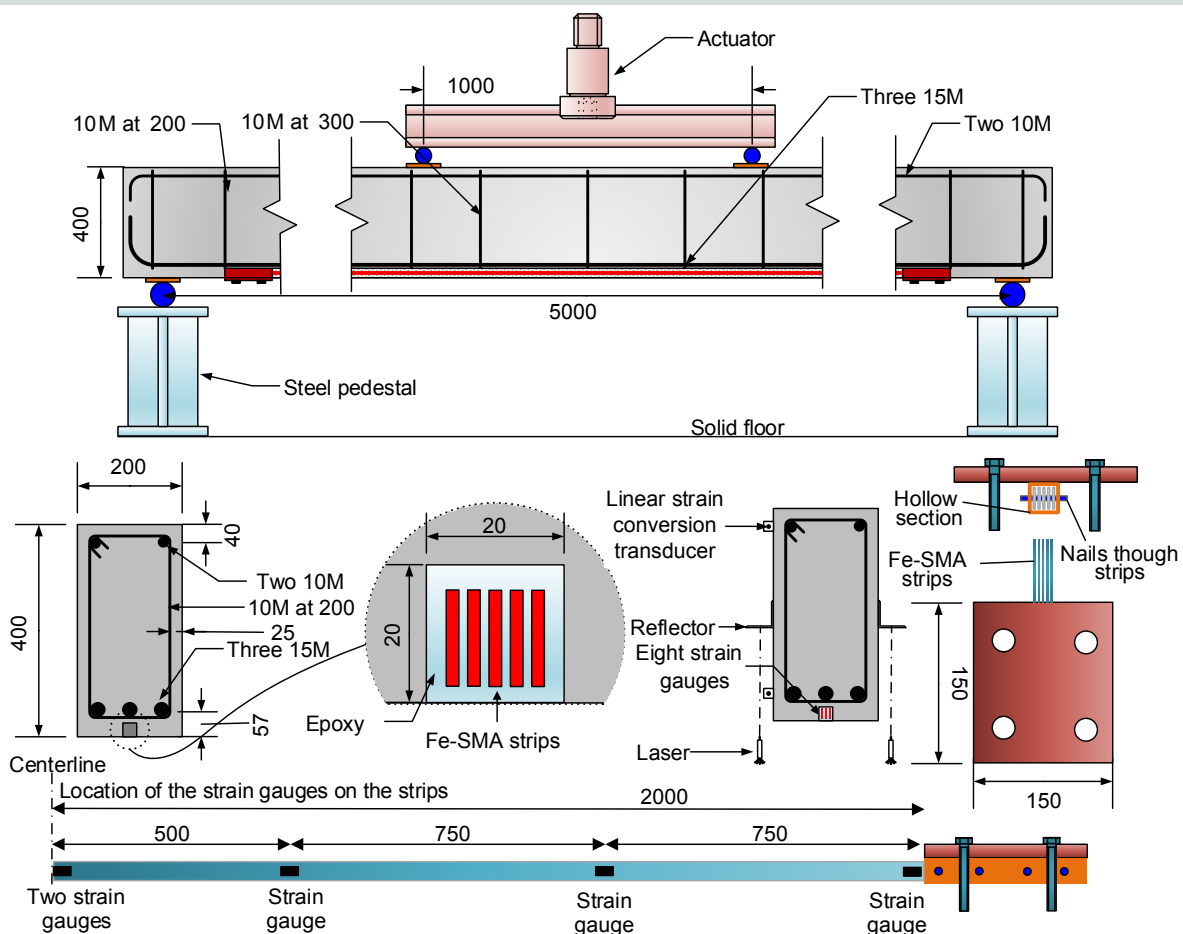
Geometric details of a typical beam. Note: All dimensions are in millimeters. Fe-SMA = iron-based shape-memory alloy. 10M = no. 3; 15M = no. 5; 1 mm = 0.0394 in.
